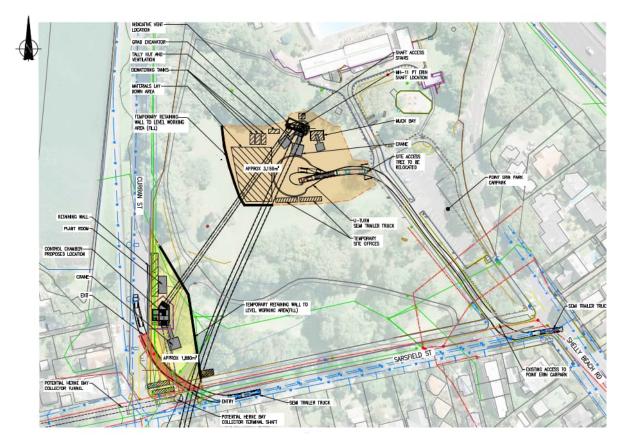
Point Erin Park general layout (main construction area shown in orange and south western construction area in yellow)
